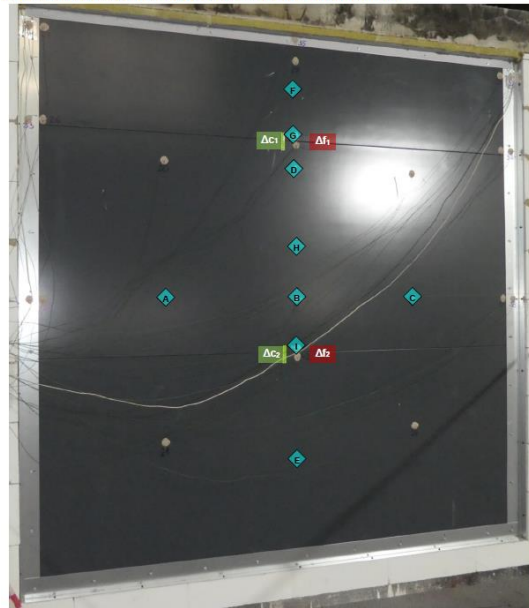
Detail of the wall sandwich panel specimen (horizontally laid) [9]
